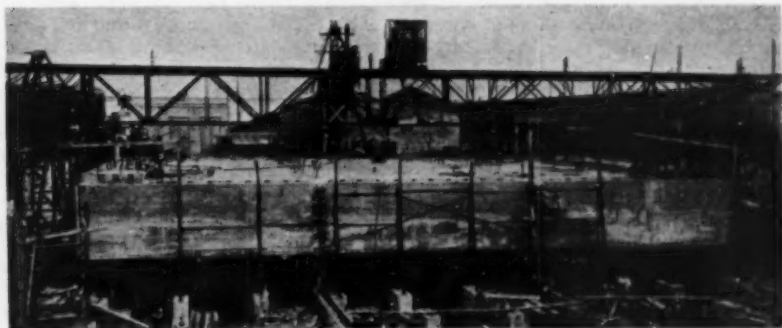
Casting Prestressed Concrete Deck Unit.
